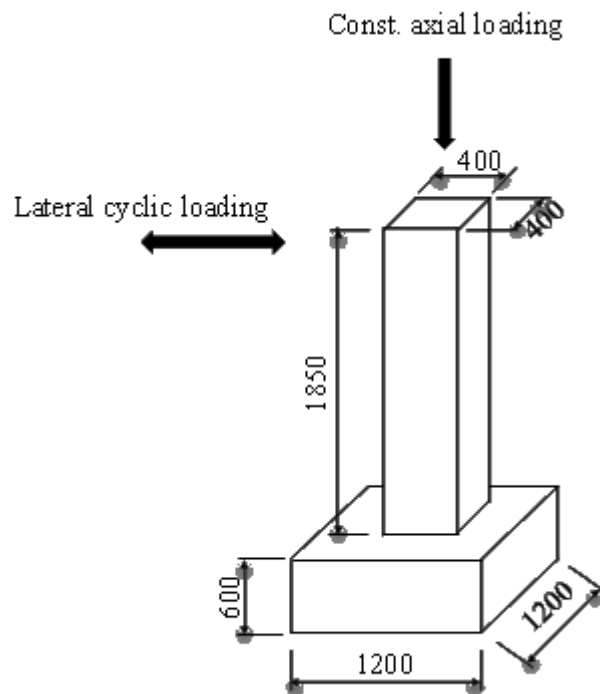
Specimen concrete dimensions.(All dimensions in mm)
